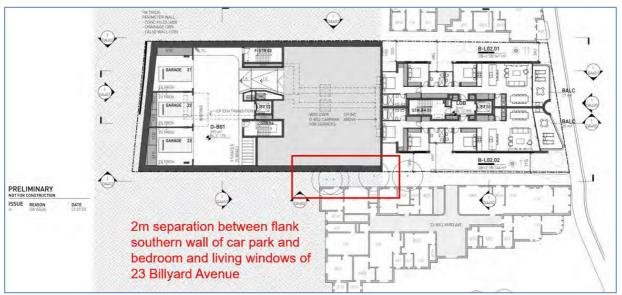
Basement car park proximity to 23 Billyard Avenue, drawing DA103 Rev.A. (Smart Design Studio) Annotation added
